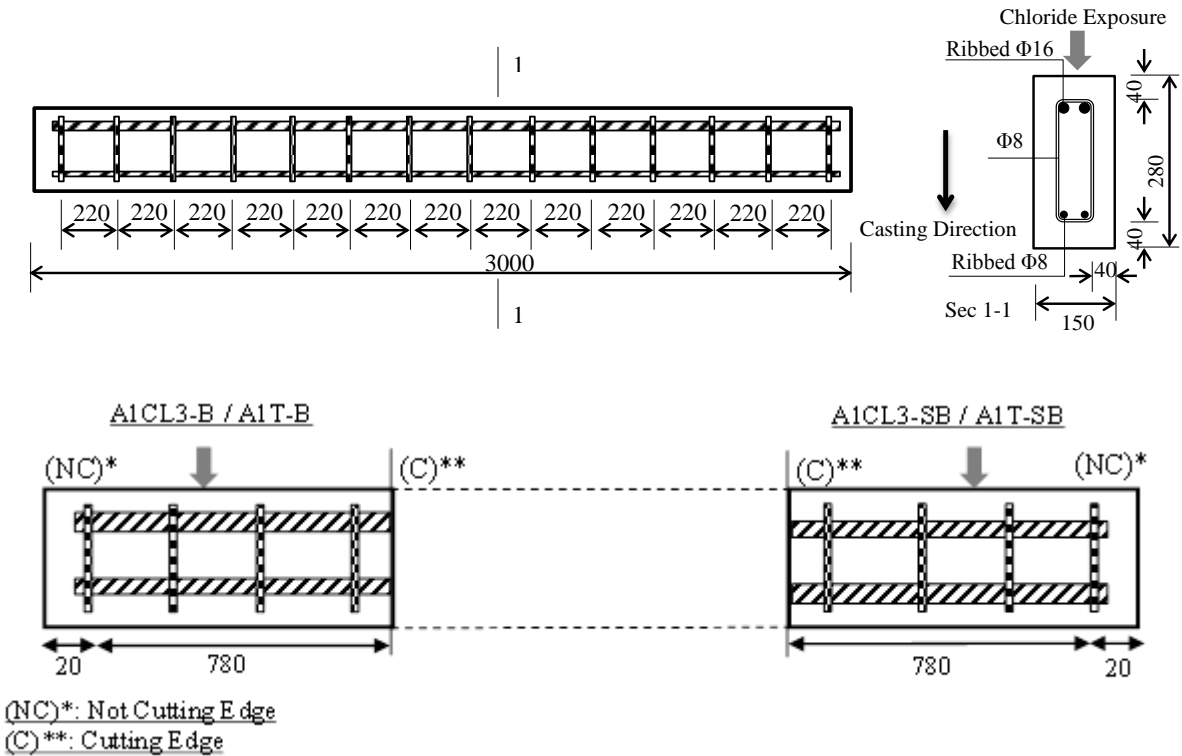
Reinforcement layout all beams. Dimensions are in mm
